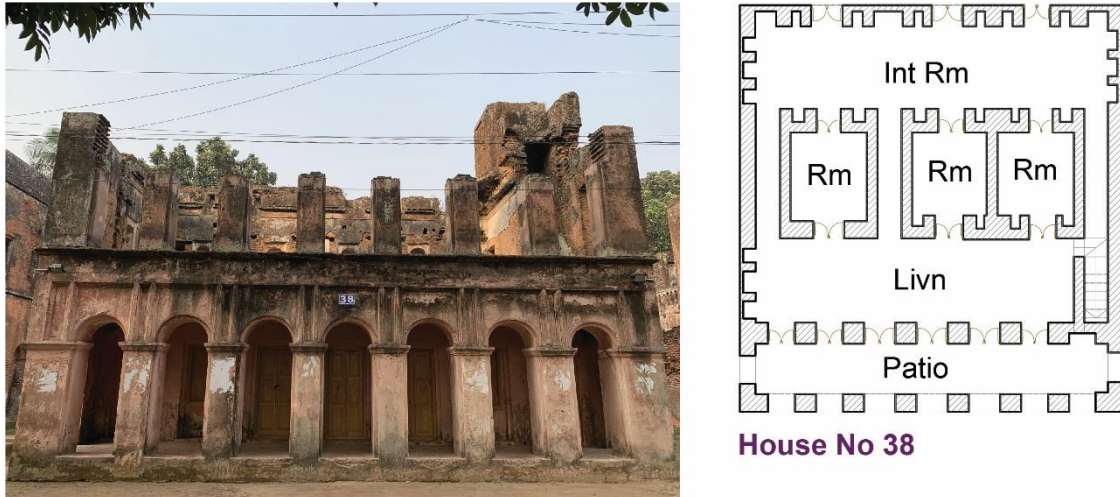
The plans of number 38 building of Panam Nagar, plans are collected from the Archeology department of Bangladesh, (Source - Author, 2020)
